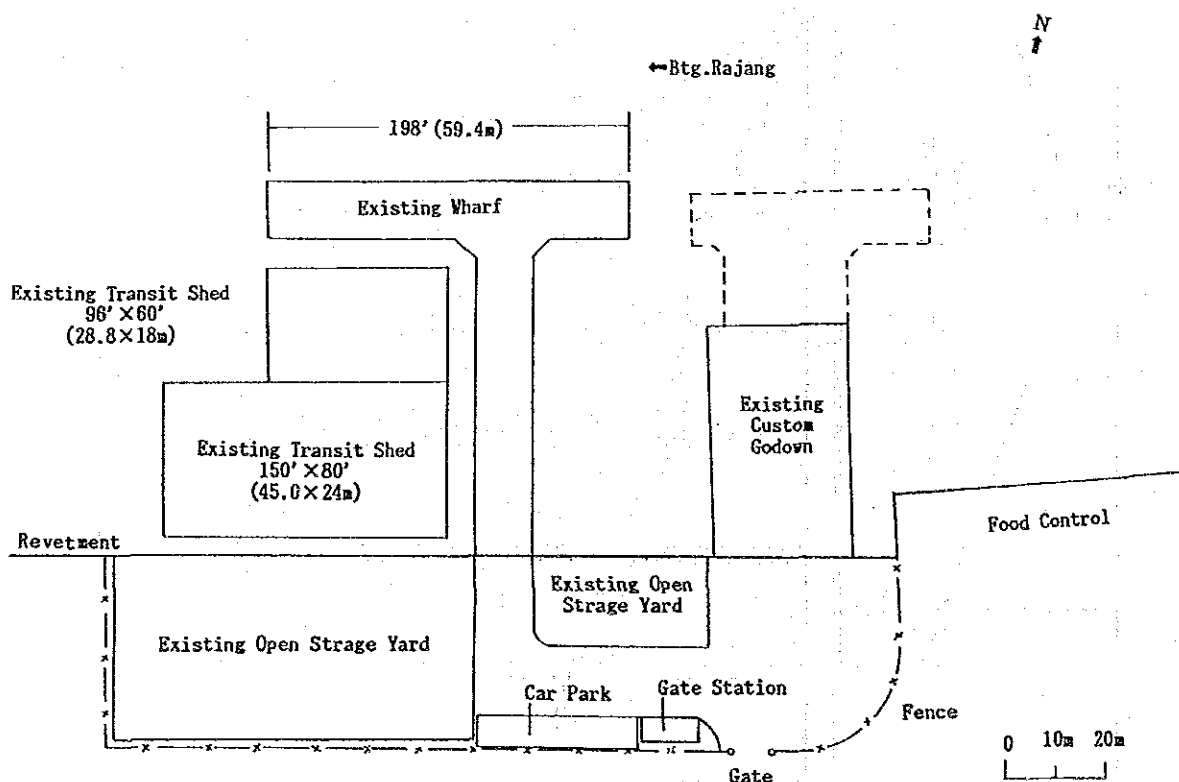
Layout of Existing Sarikei Wharf
